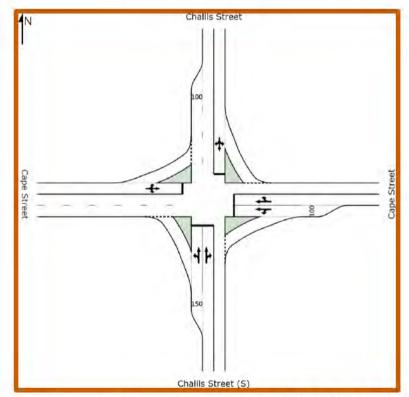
Recommended Layout for the Intersection of Challis Street and Cape Street
